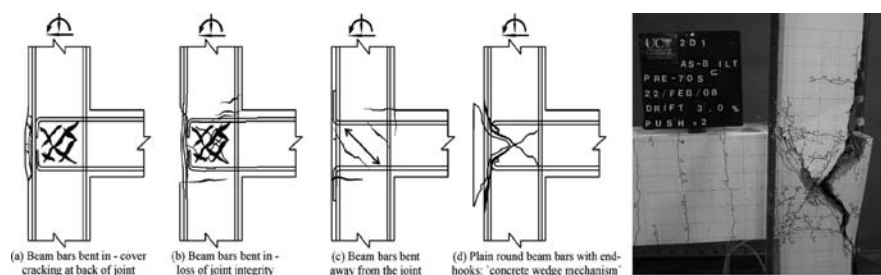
Alternative damage mechanisms expected in exterior joints depending on the structural detailing. *Left (a,b)* beam bars bent inside the joint region; *(c)* beam bars bent outside the joint region; *(d)* plain round beam bars with end-hooks. *Right*: observed “concrete wedge” mechanism in an exterior joint subassembly subjected to laboratory simulated seismic loading [24]
